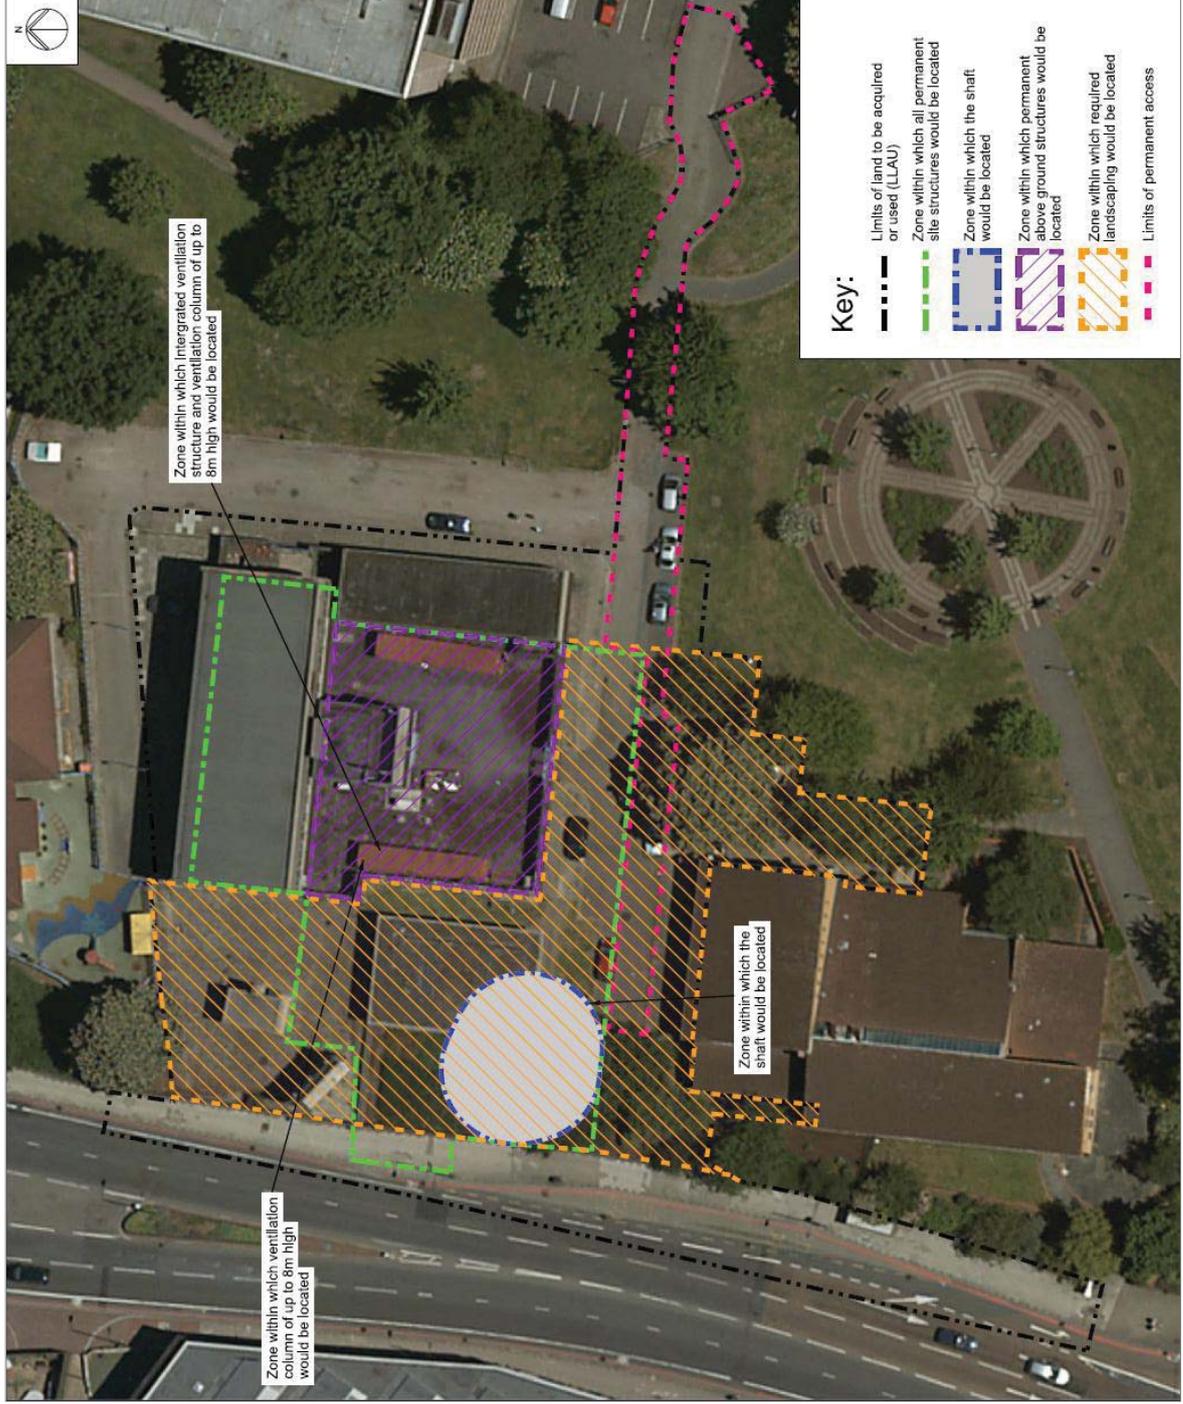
Schematic layout at the Falconbrook Pumping Station site
